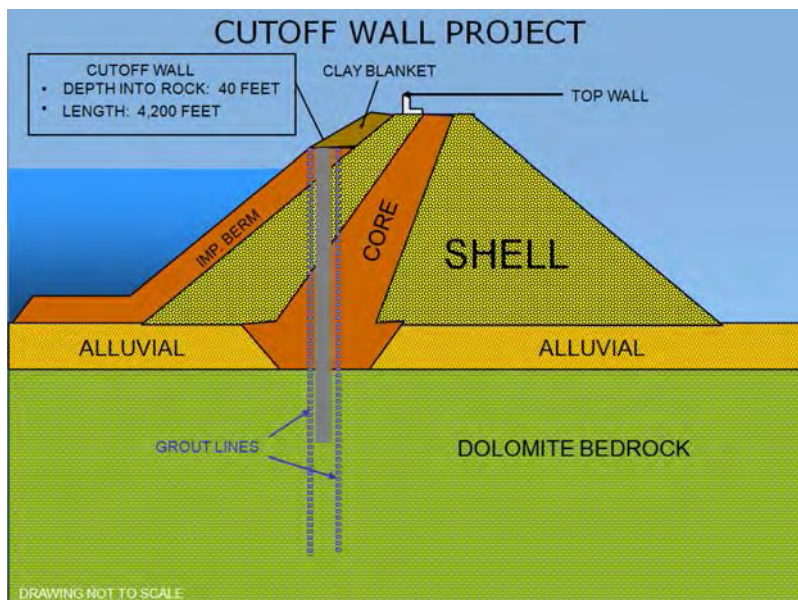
Cutoff wall extended 40 ft into the dolomite.
